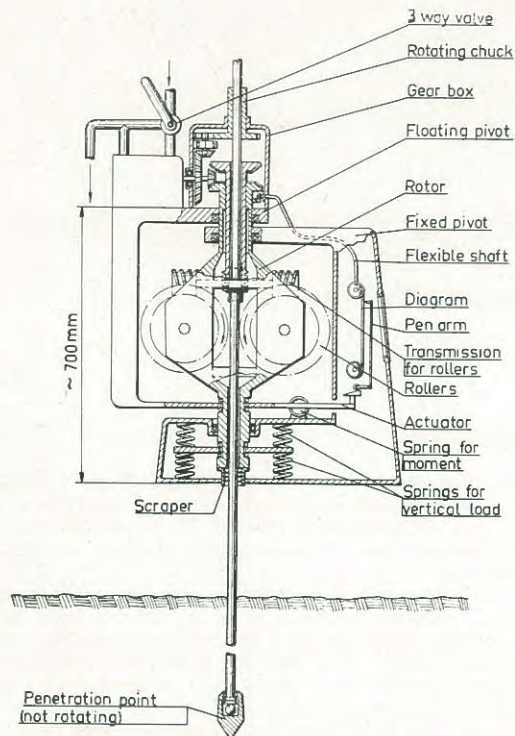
General arrangement of SGI sounding machine. Machine de sondage type SGI.
